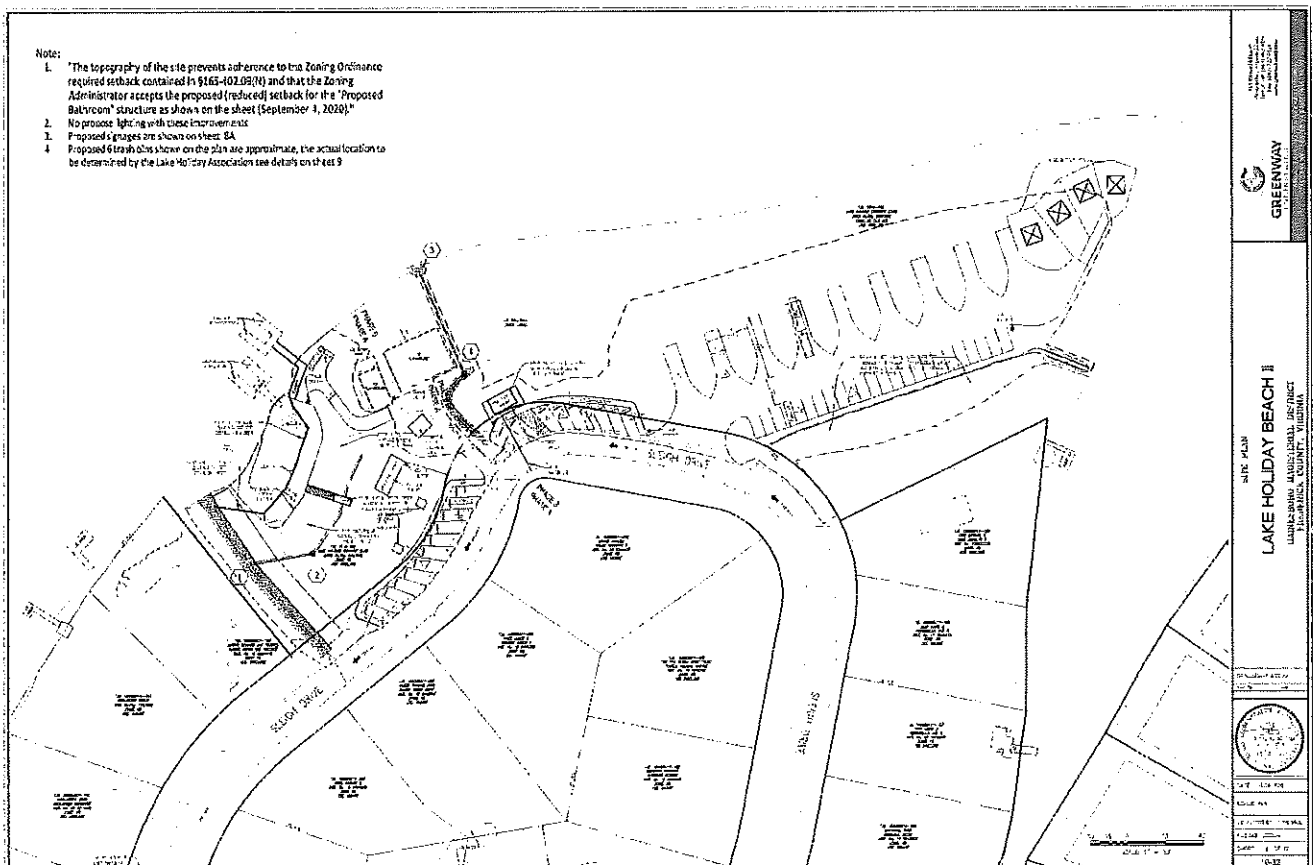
Greenway Engineering Site Plan for Proposed Beach II Improvements – Phase Two
